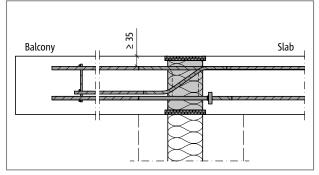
Schöck Isokorb® XT type C: Balcony projecting over corner of building (application XT type C-R)
